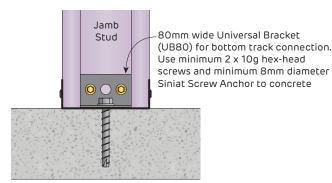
Base Connection BC4 for Prefabricated Door Frames Section
